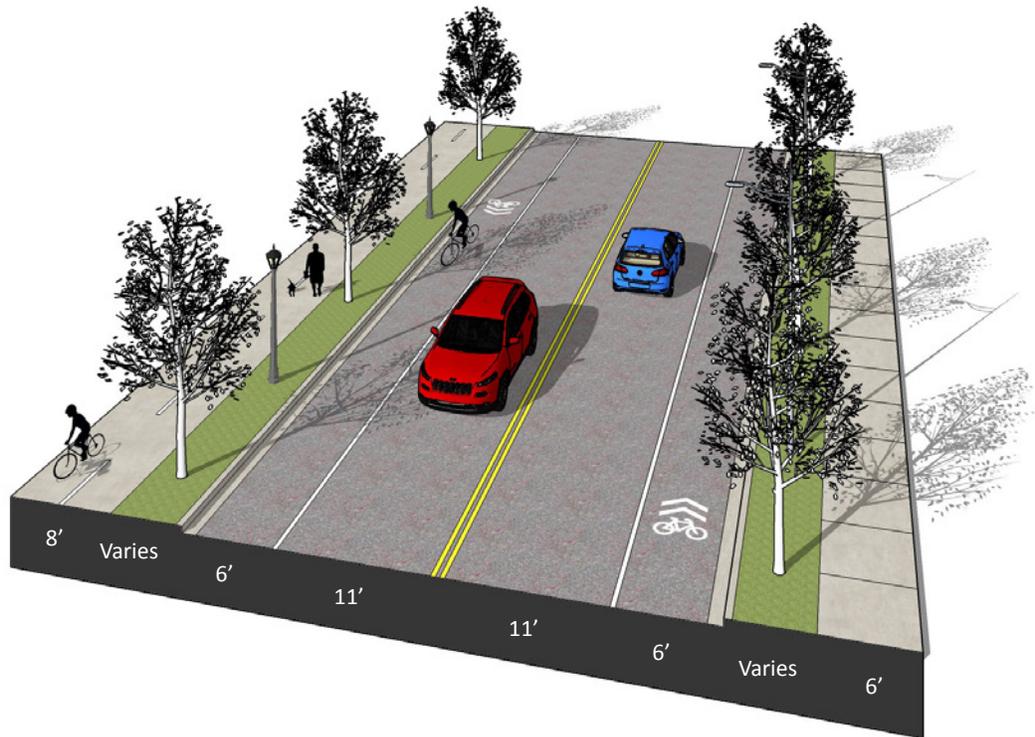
Infill construction emphasizing filling the gaps in existing trail segments. Include bike lanes when possible in street rehab projects.
